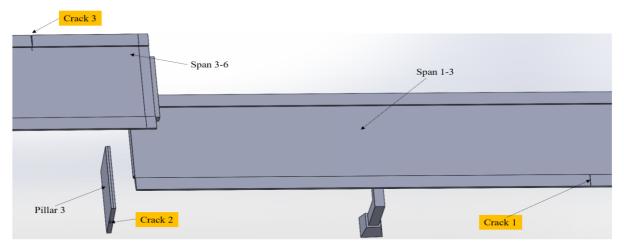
Locations of cracks 1,2 and 3 on Herøysund bridge model.
